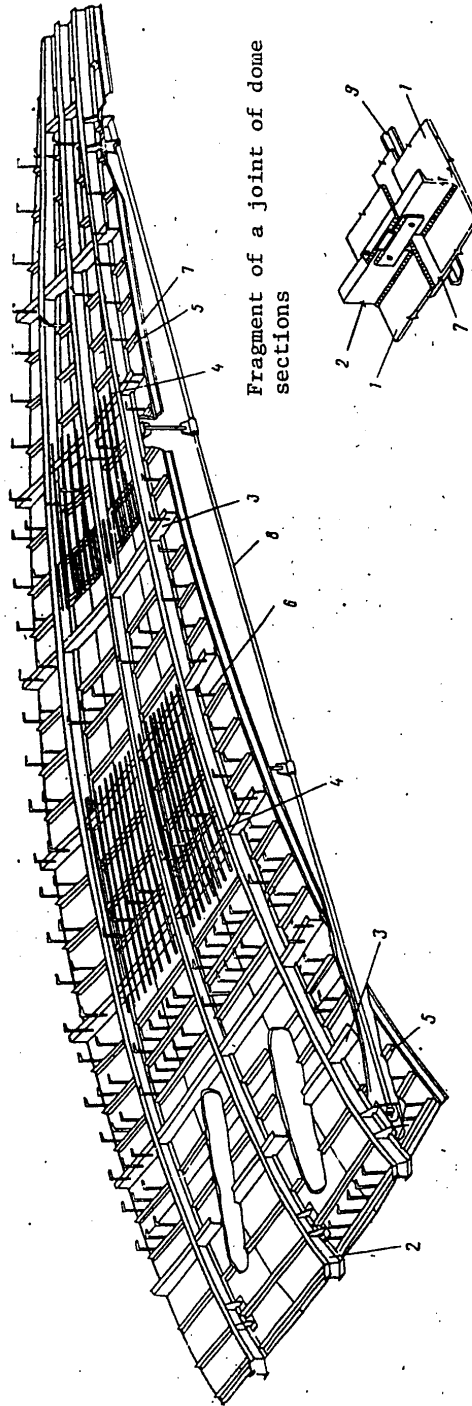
Metal frame dome section. 1 -- sealing lining made of sheet steel; 2, 3 -- radial and annular stiffening ribs; 4 -- reinforcing rod; 5 -- angle for fastening the anchor rod; 6 -- anchor rod; 7 -- cover plate; 8 -- tie bar; 9 -- batten for monitoring density of the installation welds.
